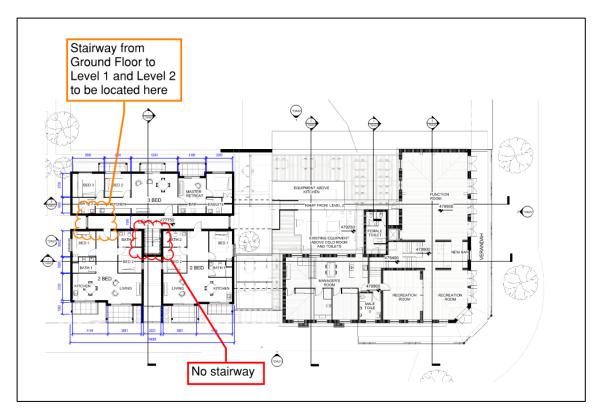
Floor Plan – Proposed Level 1 (Amended by Council 19 August 2024)
